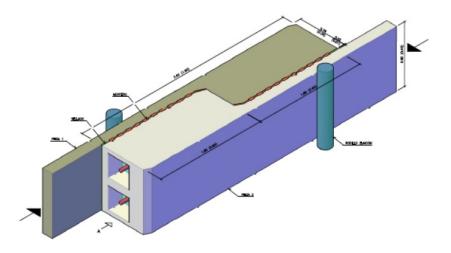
The laboratory set-up to examine the behaviour of the horizontal joints, taken from Mendizabal (2014)
